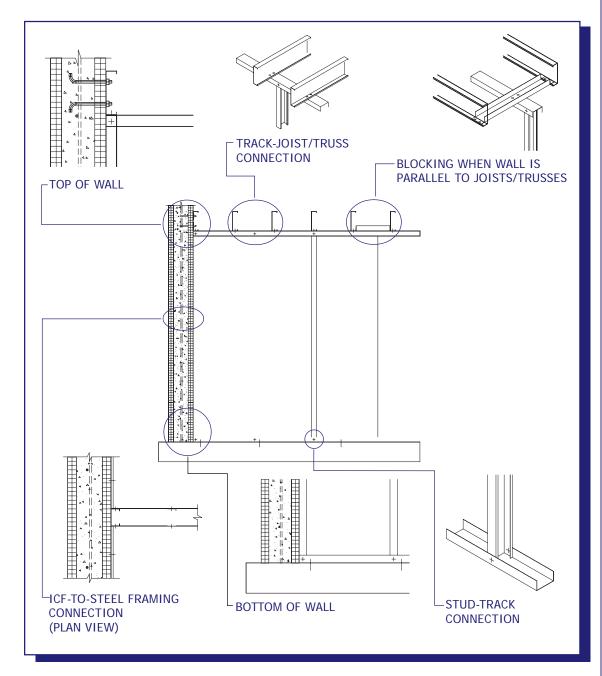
Typical ICF-to-Light Gauge Steel Wall Connection Details
